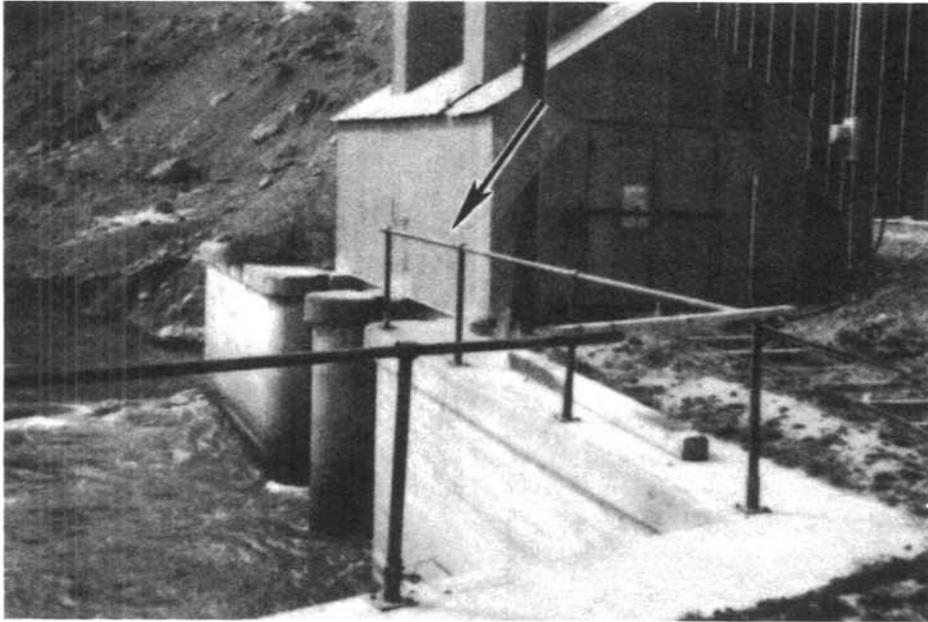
Broken guardrail has been patched with a timber board and should be replaced with a pipe of original design. Also, the guardrail should be extended to the equipment house to prevent anyone from falling through the opening.
